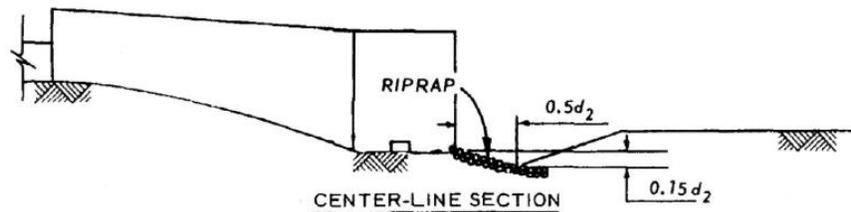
Section view of stilling basin showing downstream pre-formed scour hole (plate C-43, EM 1110-2-1602)
